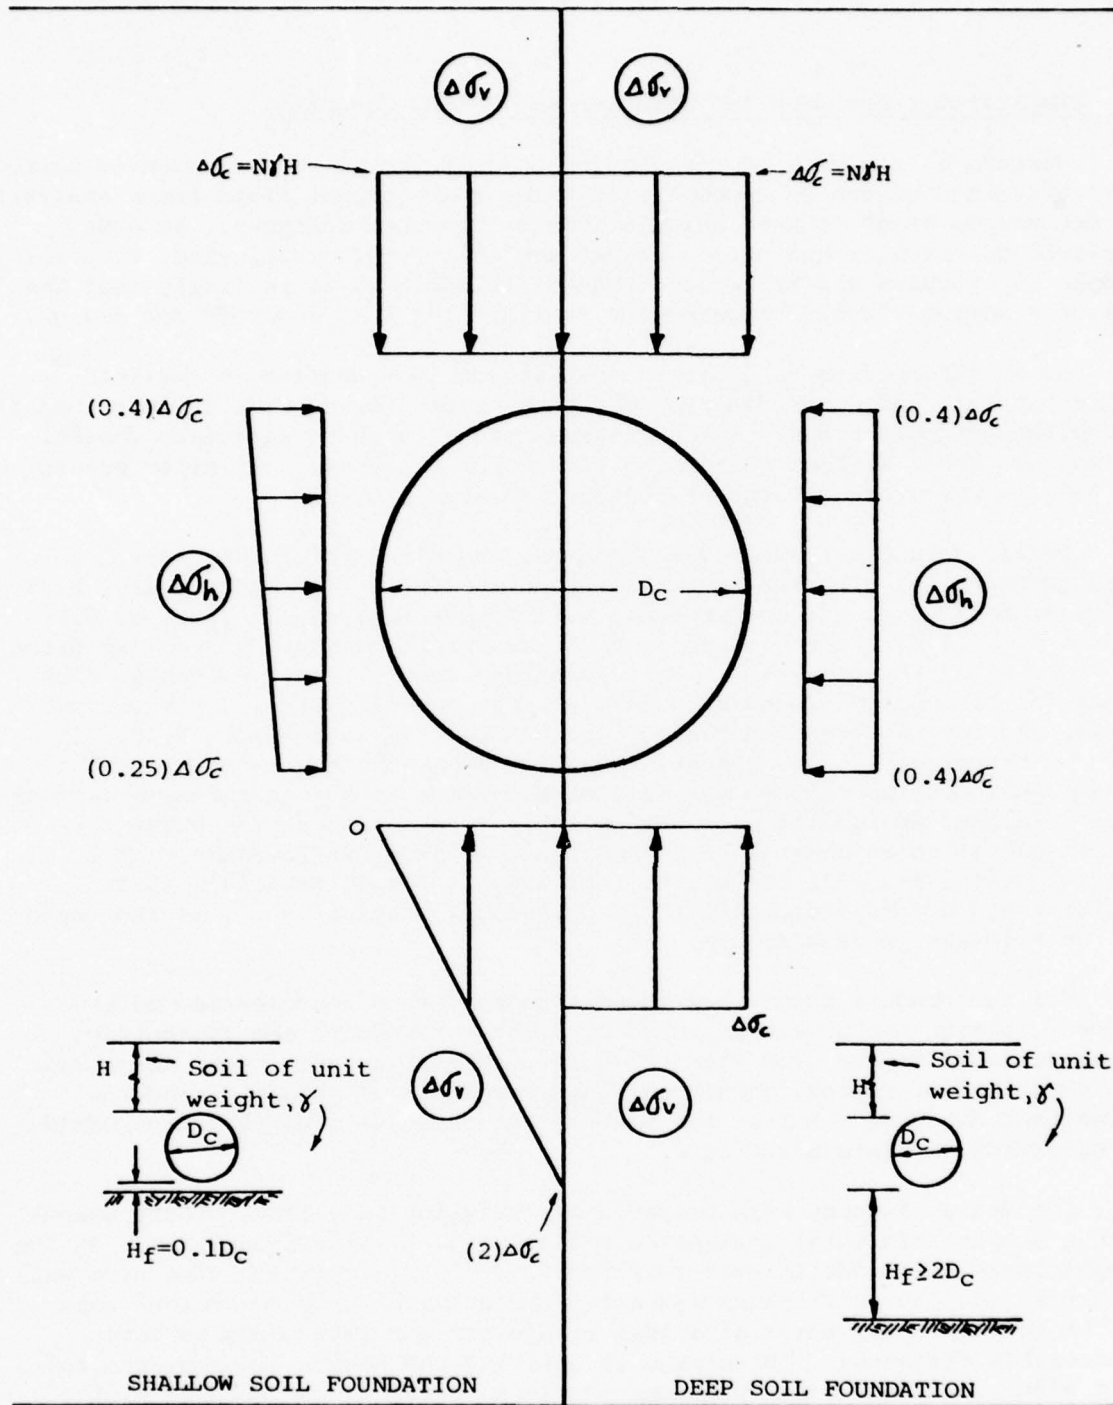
EARTH PRESSURE DIAGRAMS FOR A CIRCULAR CONDUIT ON SHALLOW AND DEEP SOIL FOUNDATIONS
